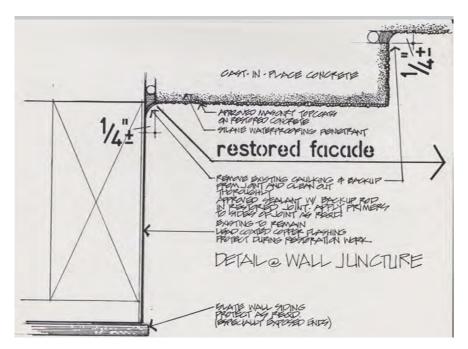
1986 Construction Detail at Wall Juncture. Shows connection between concrete and slate-clad wall surfaces. Eberson and Toto, Detail D/5.)
